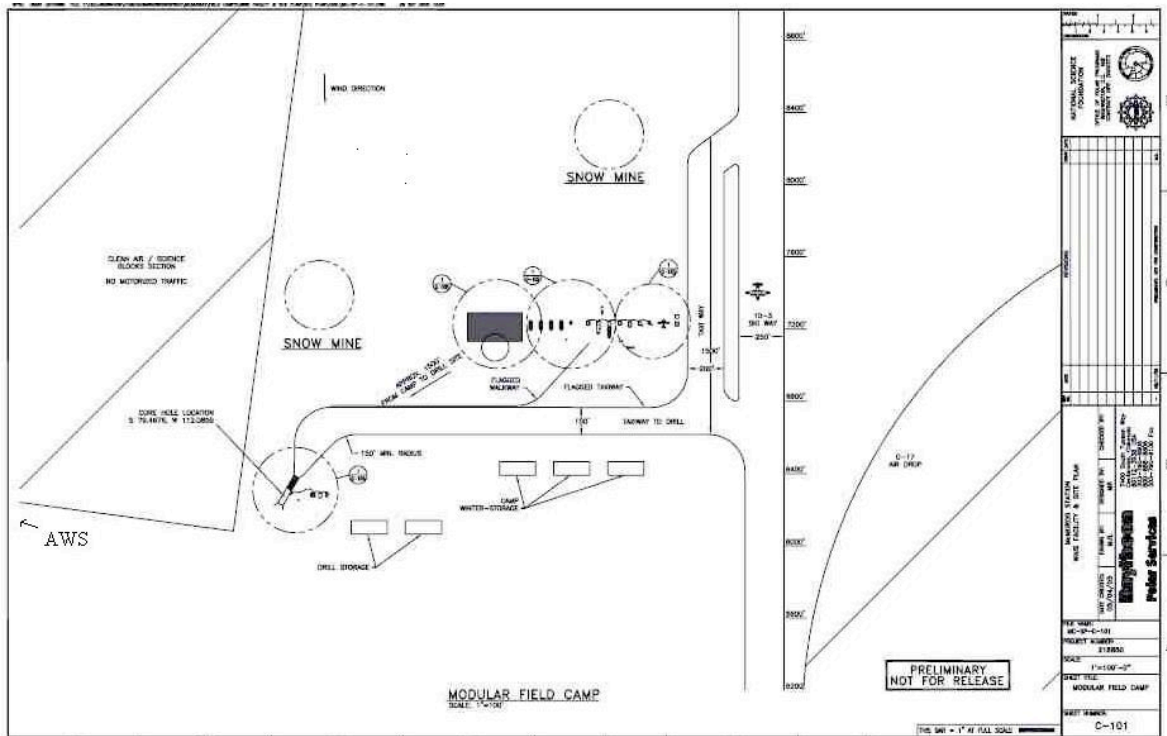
Layout of WAIS Divide Camp and location of AWS Kominko-Slade.
